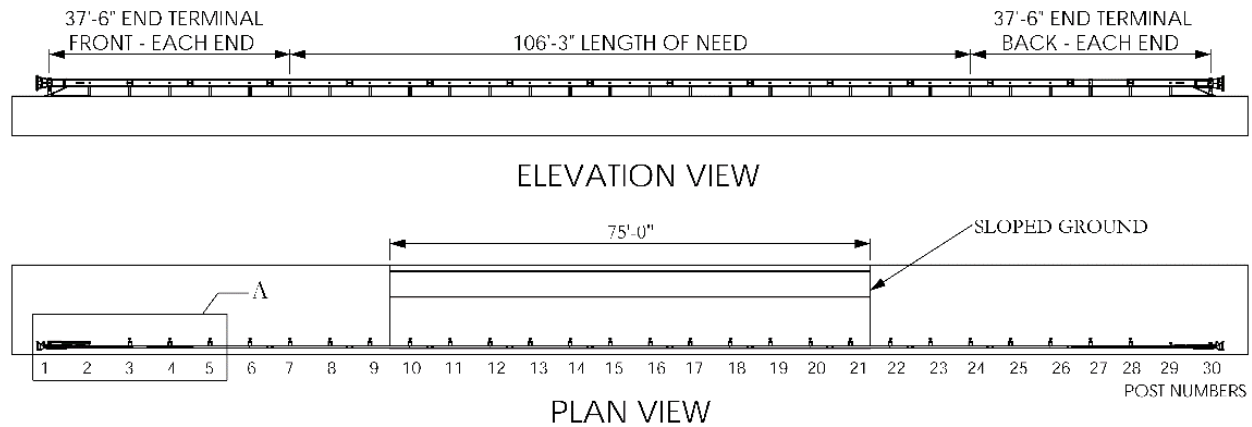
Guardrail on Slope System as Tested by TTI.
